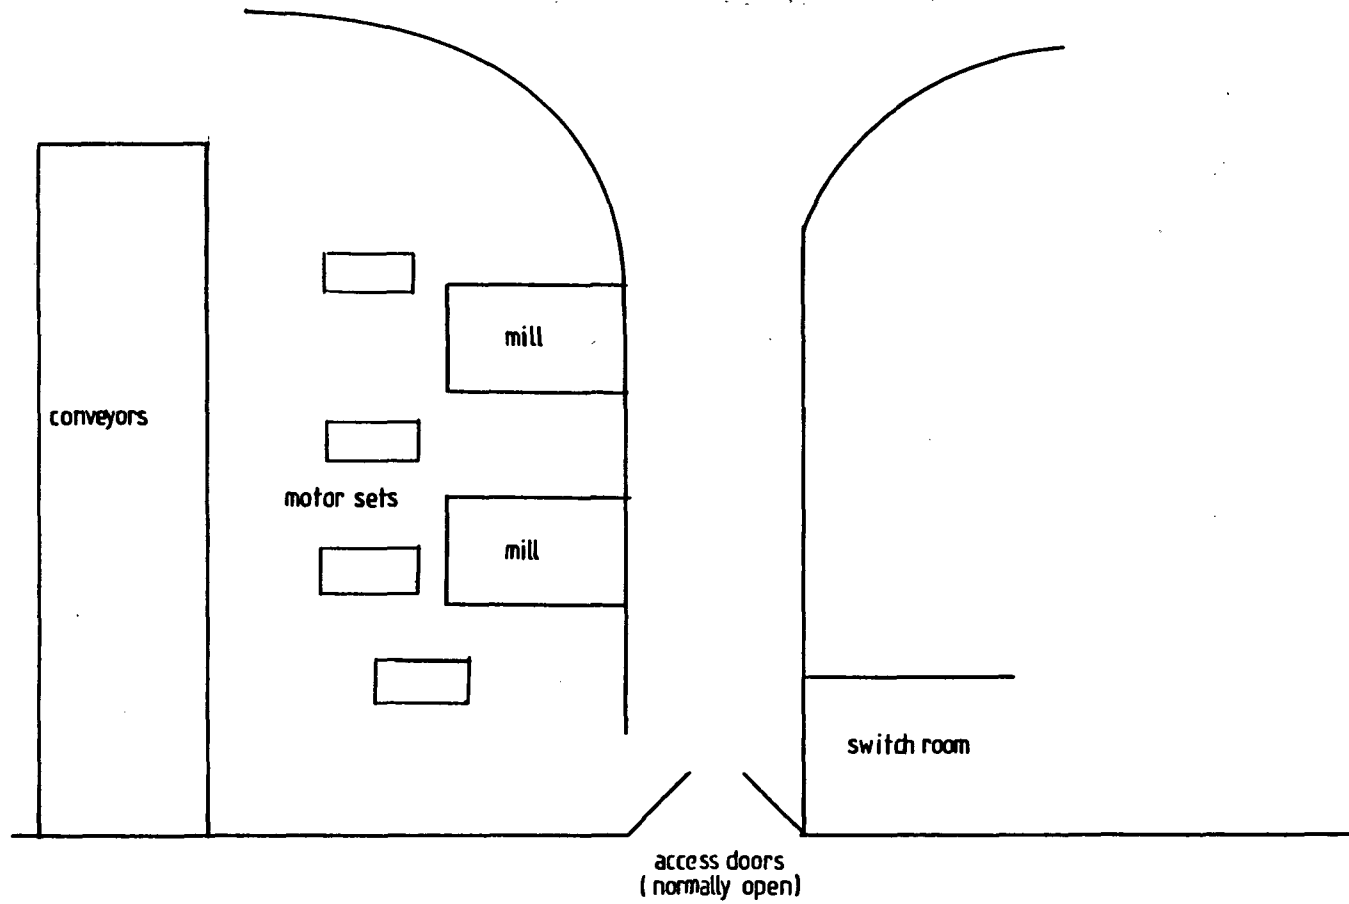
Generalised floor plan of phosphoric acid plant at Fertiliser factory.
